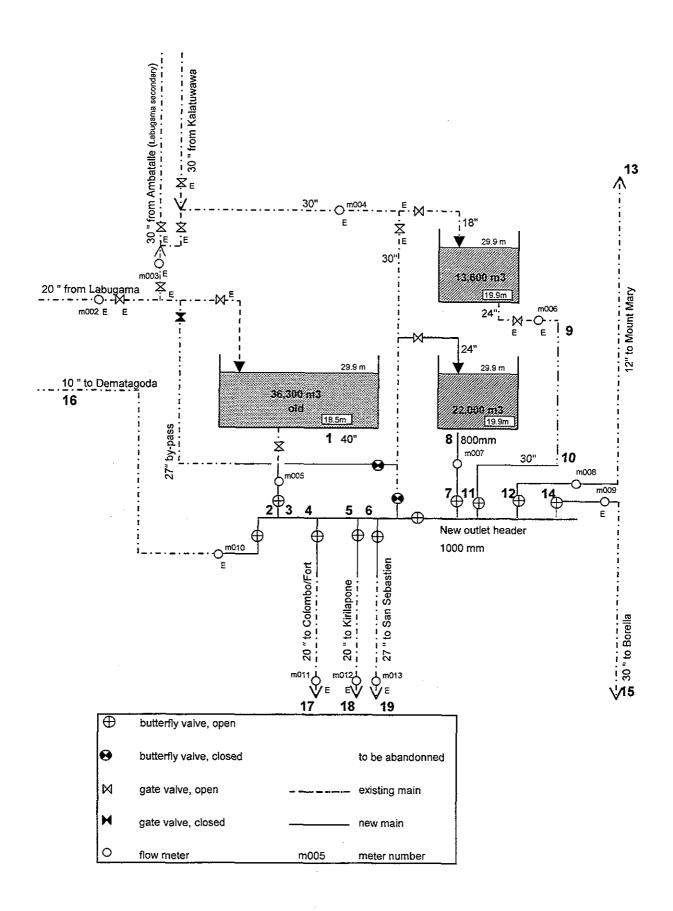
Maligakanda Reservoir - piping schematic for single tank option overflow and washout drains not shown for clarity
